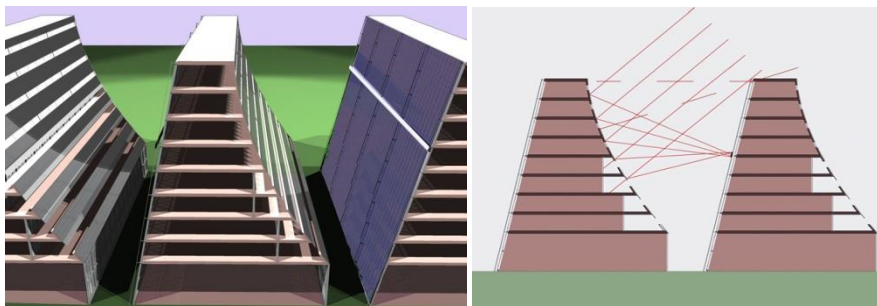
Building integration of CPC reflectors, with tracking absorber on opposite building
